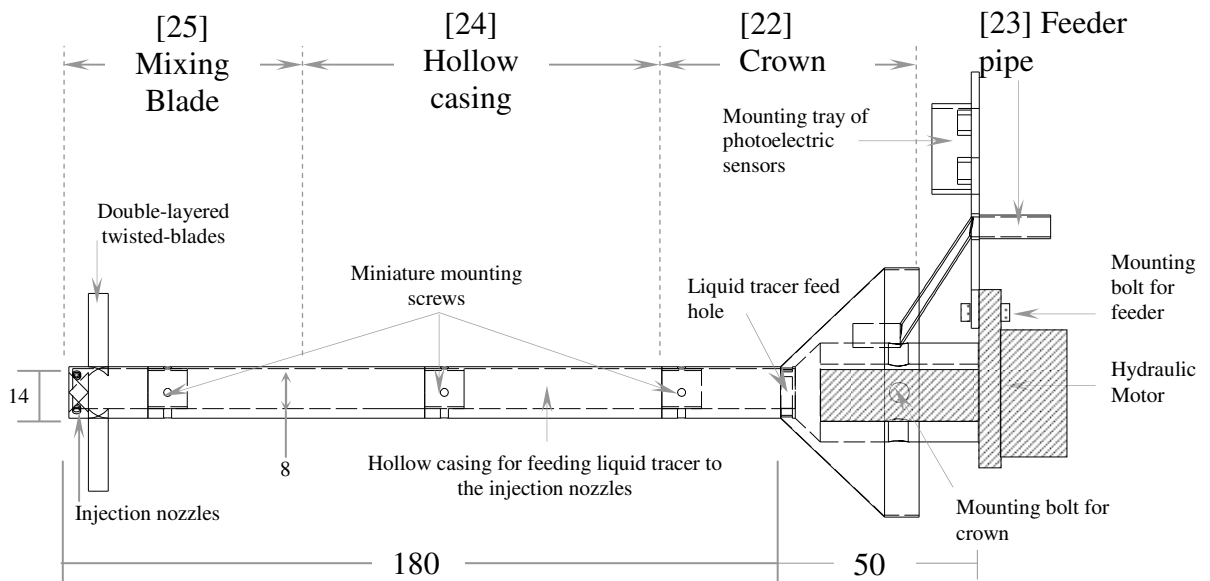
Schematic of in-flight DM installer B (all dimensions in mm).
